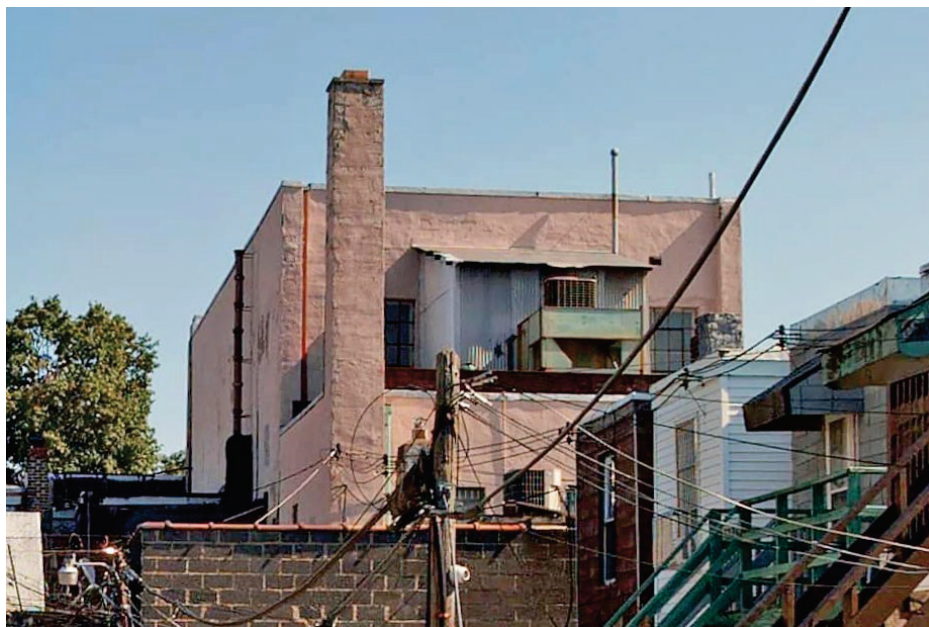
Partial view of the west elevation, looking east from Fairhill Street.
